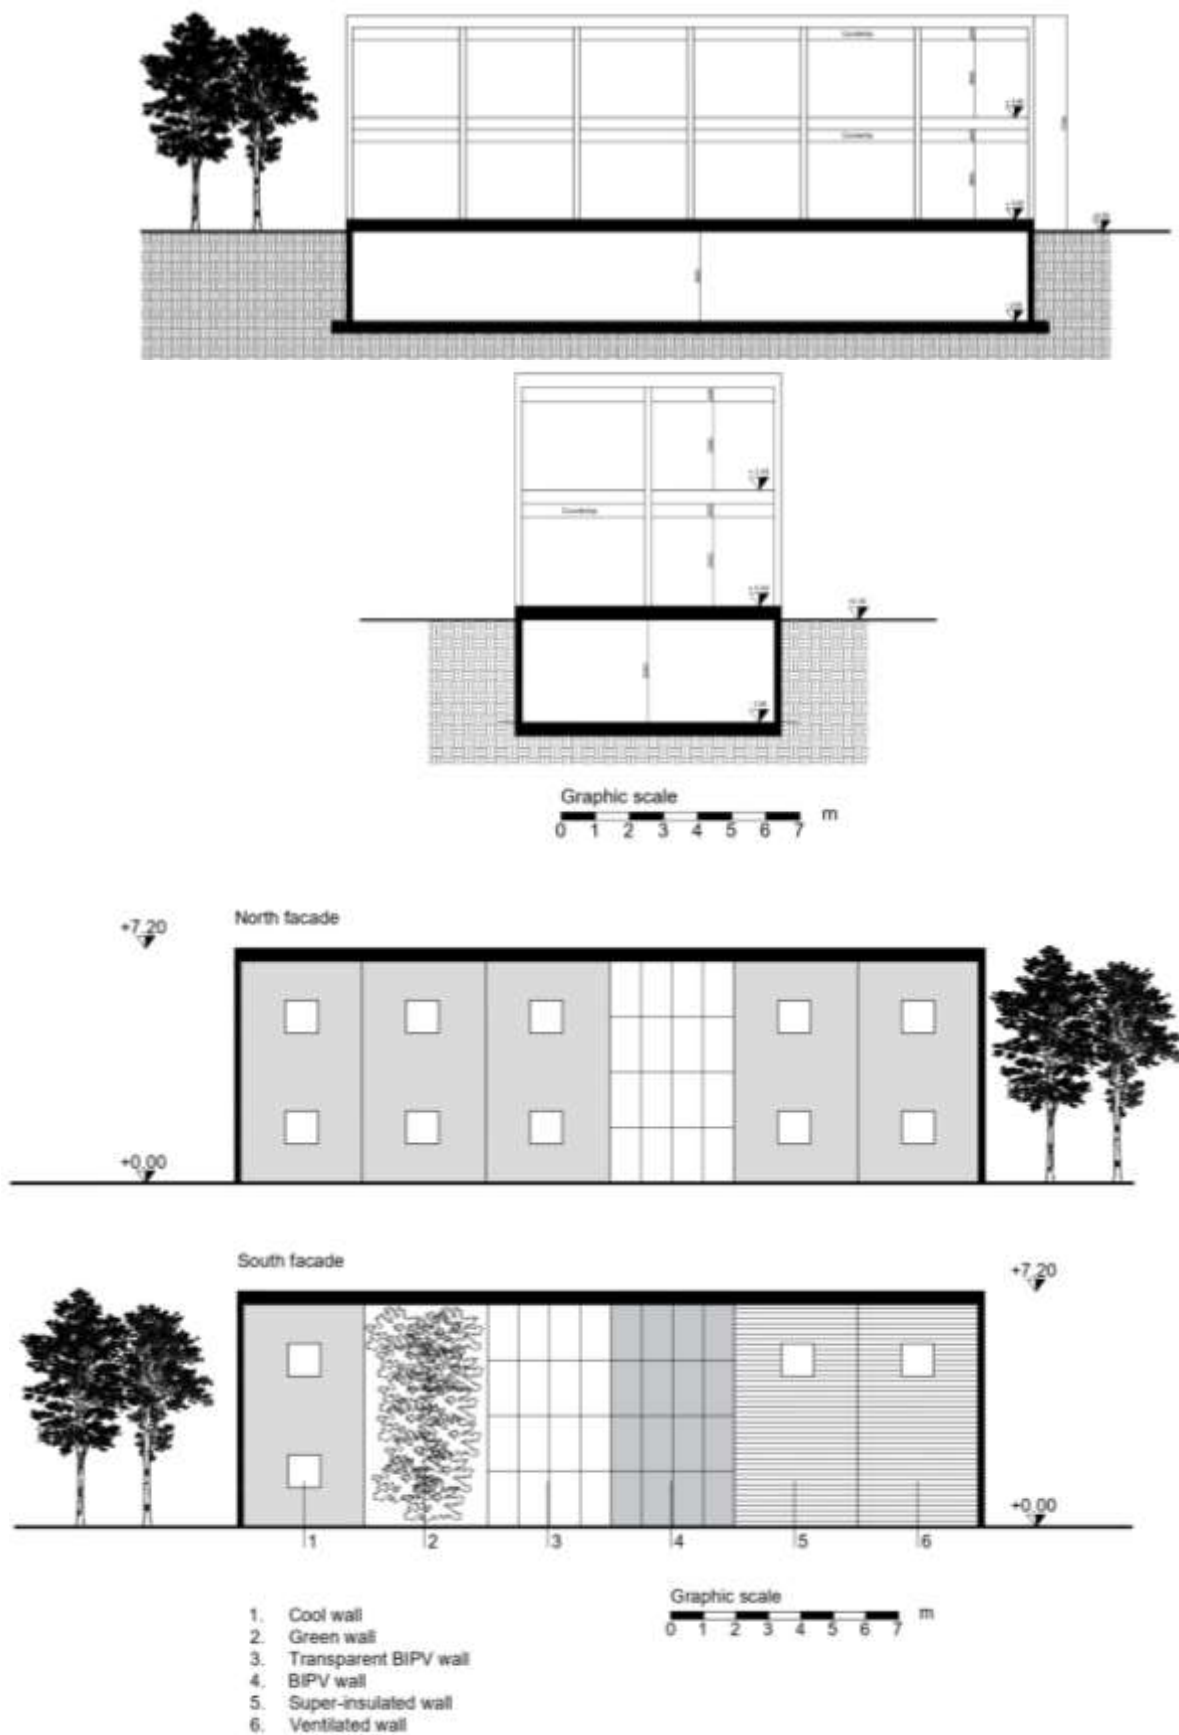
Schematic sections and elevations of the New Building. Source: UNITN
